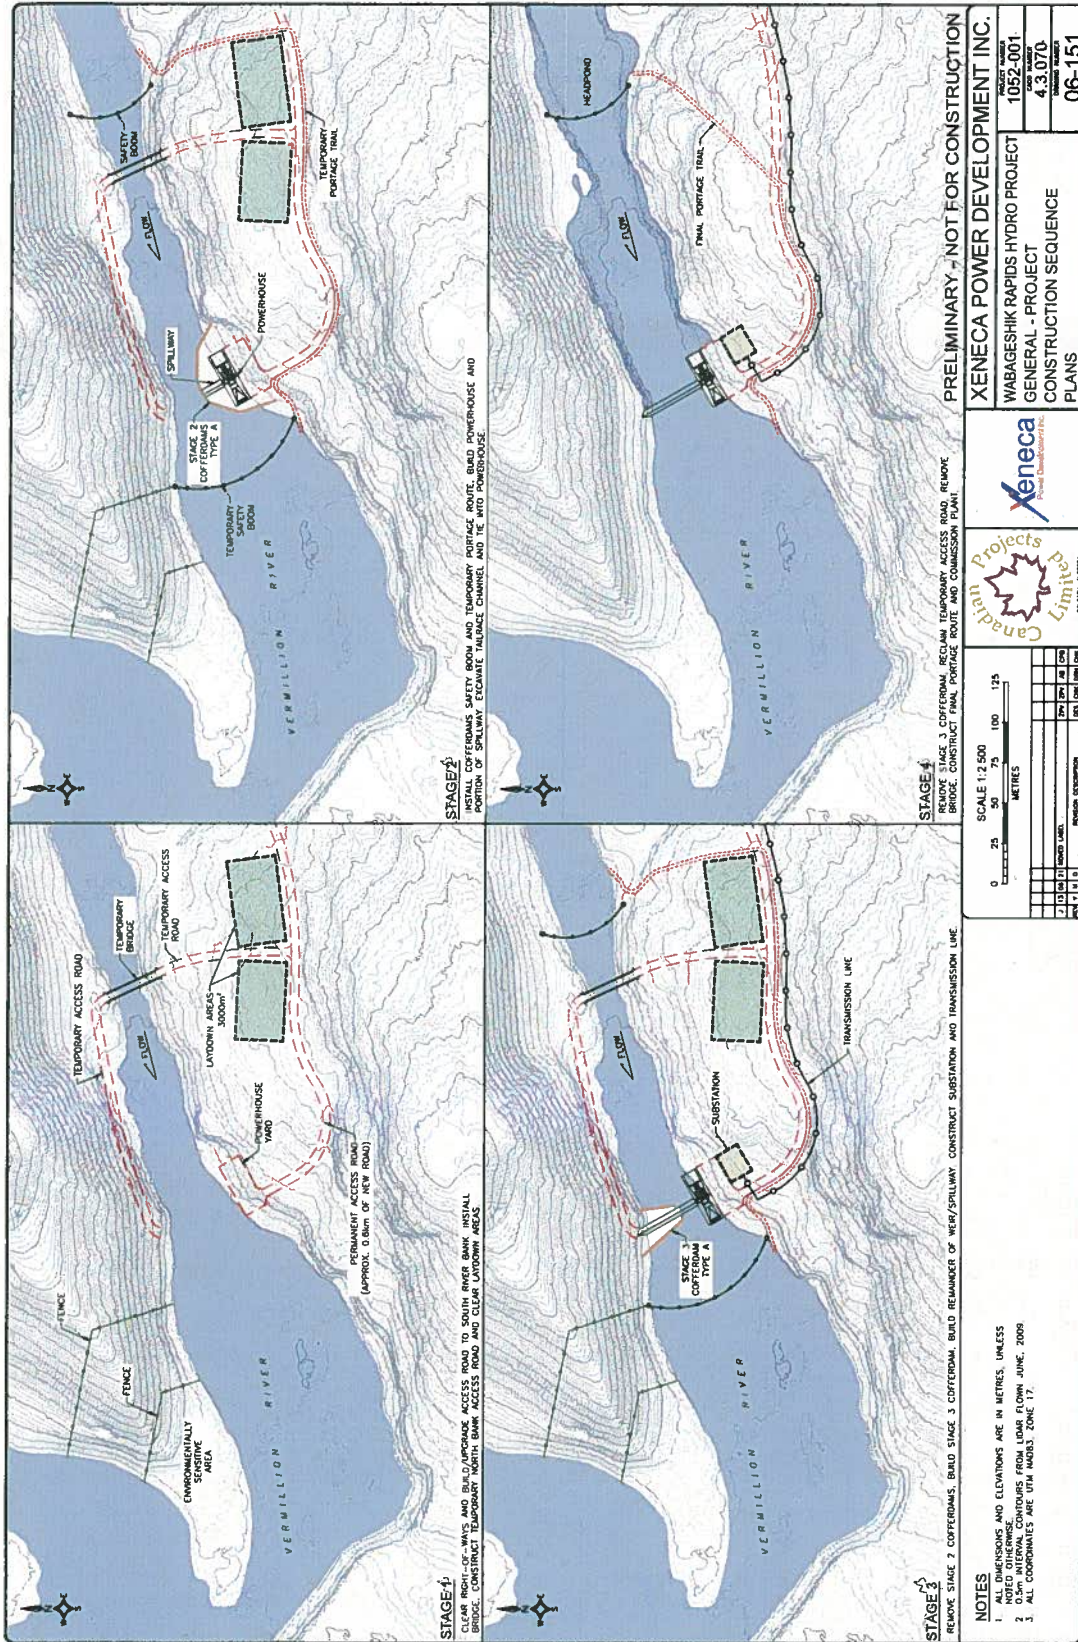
Proposed construction, laydown and temporary road options, Wabageshik Hydro project.
